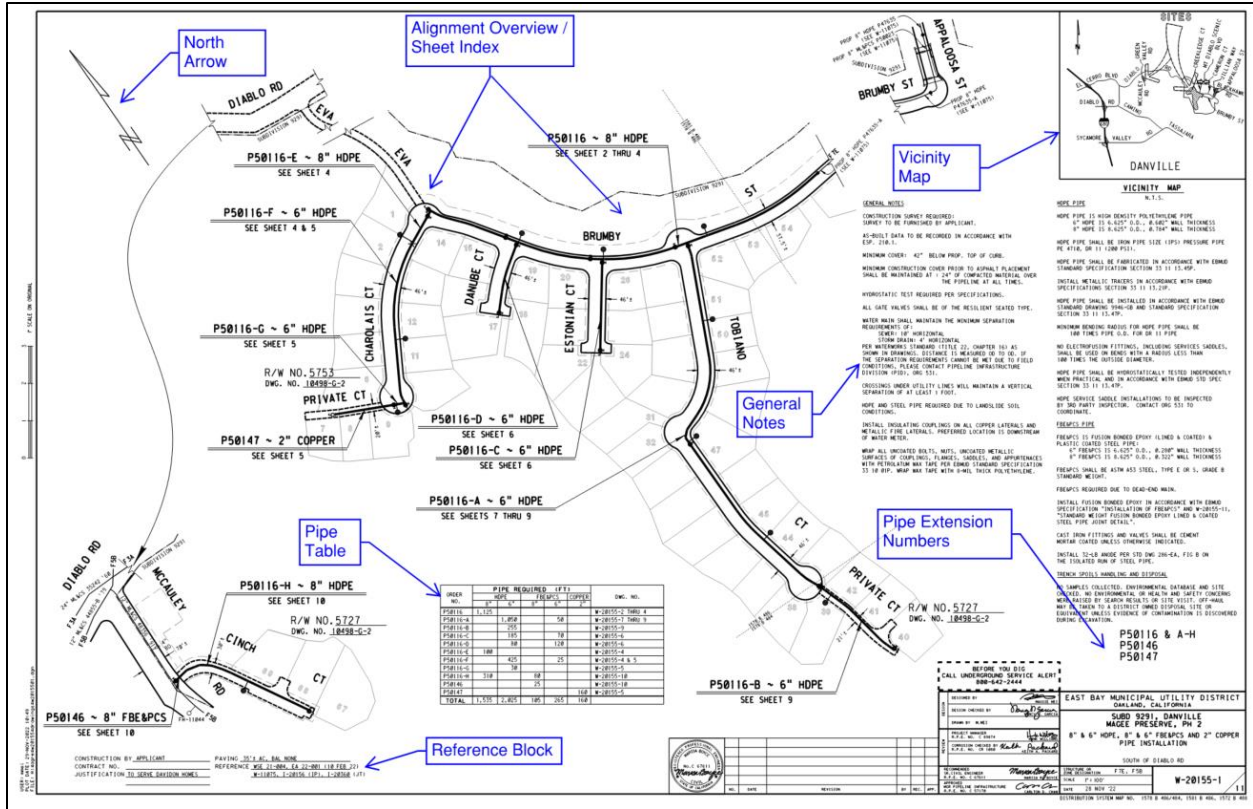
Cover Sheet for Applicant Main Extension Project with Multiple Plan Sheets
